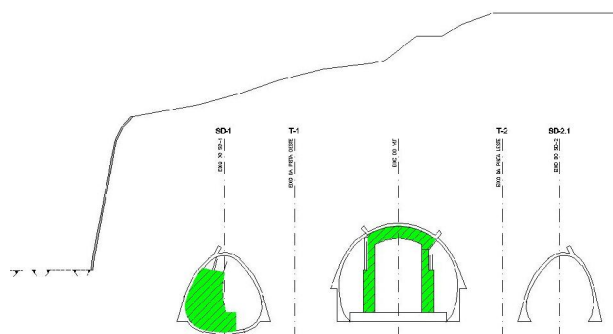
Concreting of the internal structure of the center tunnel and side-drift of ocean side gallery
